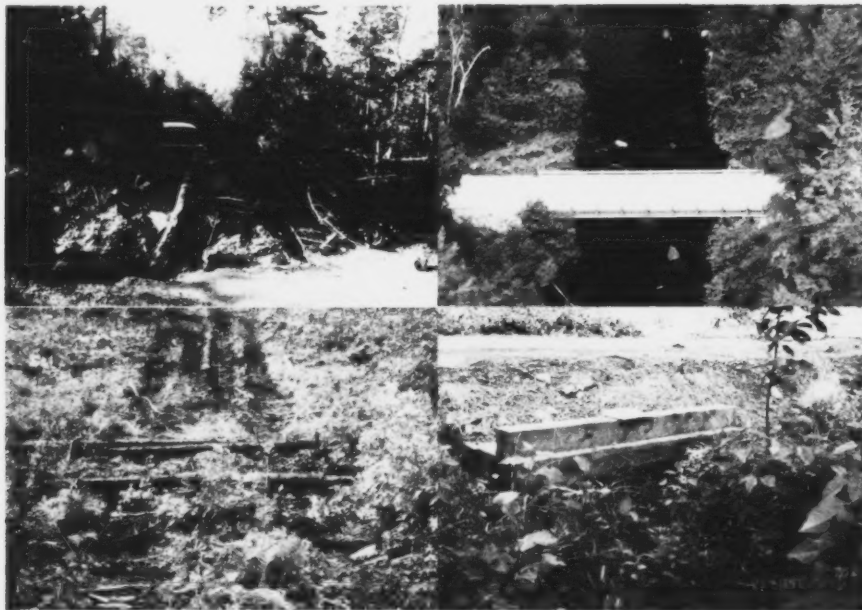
Clockwise from top left: Decommissioned road with berm; portable bridge on the Nelson River; box culvert; sill logs for a winter skid bridge over an intermittent stream.
